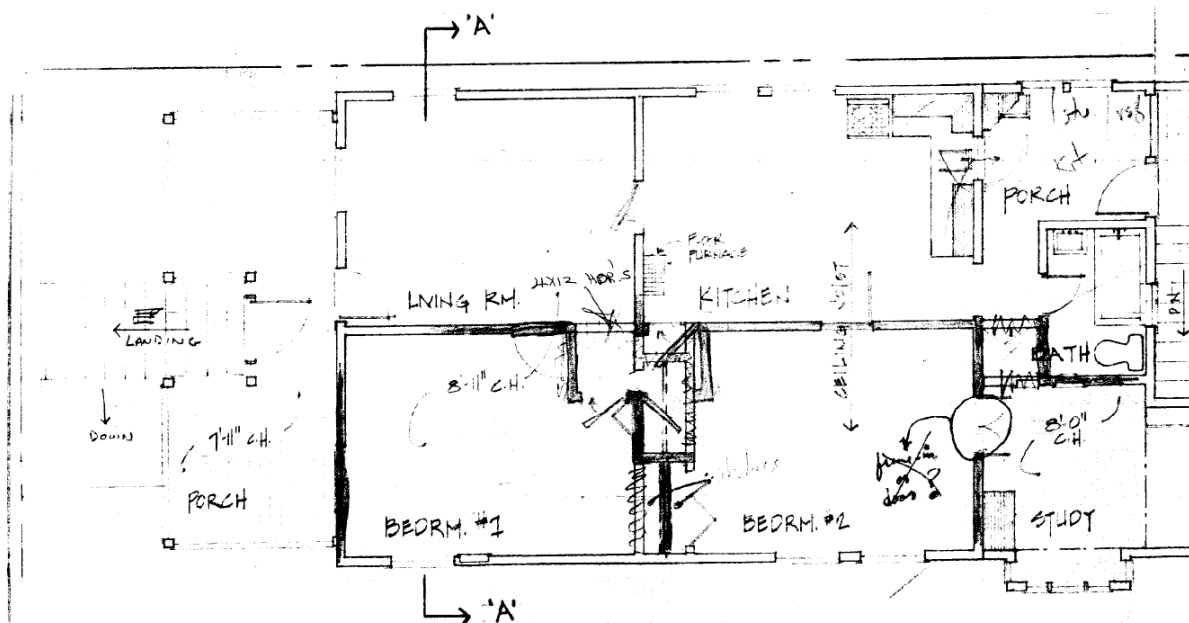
Second-story floor plan of 444 Kearney Street prior to the interior remodel in 1976 (El Cerrito Building Division).
